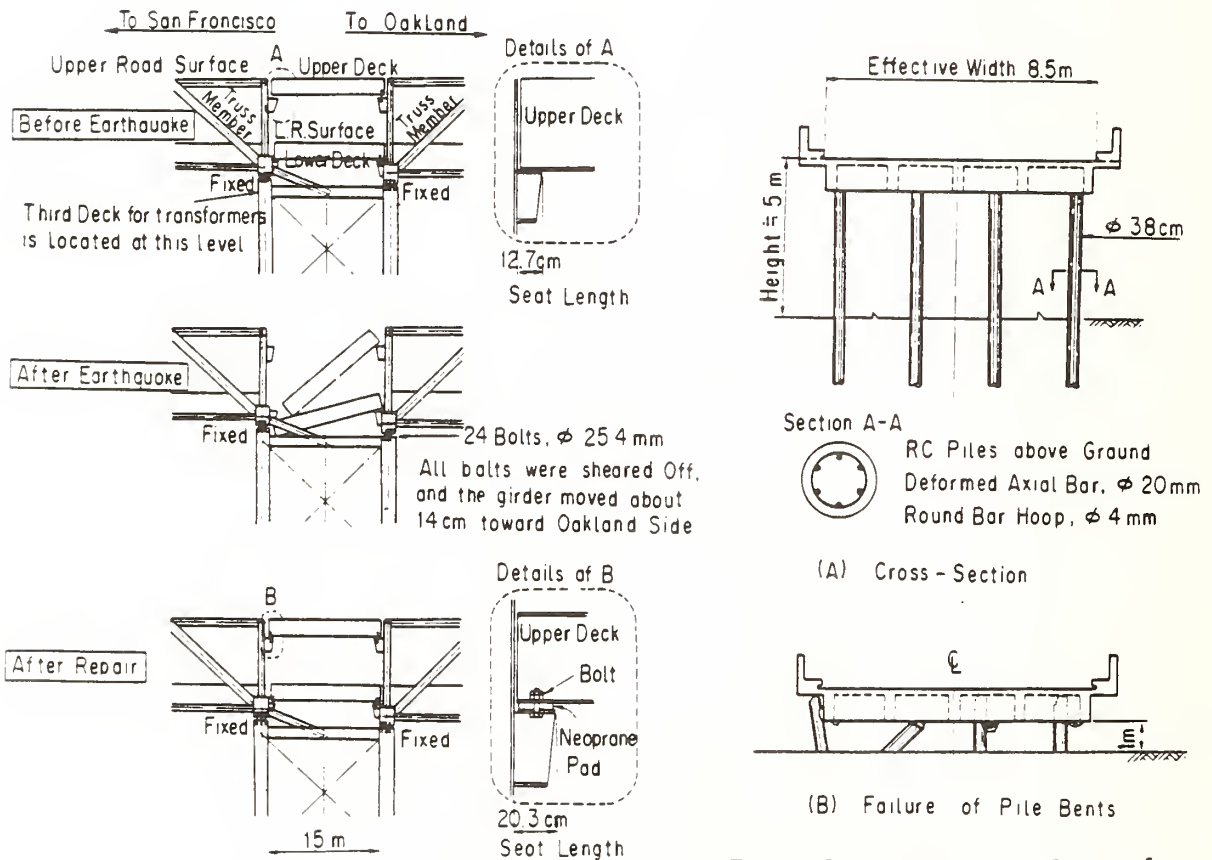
Fall of One-Span Decks on Pier E9 of Bay Bridge and Outline of Its Repair
